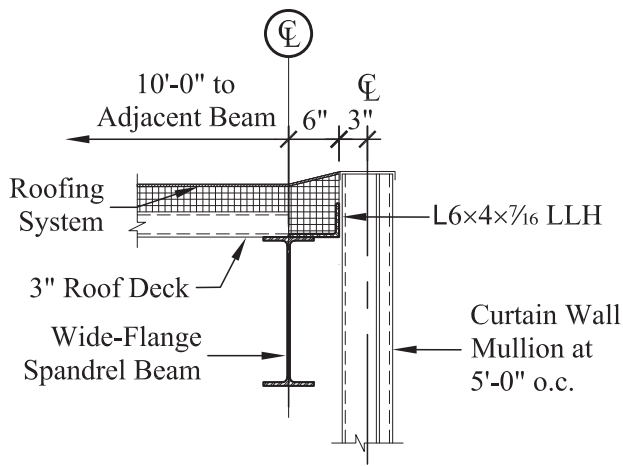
Section of roof spandrel beam with eccentric curtain wall load.
